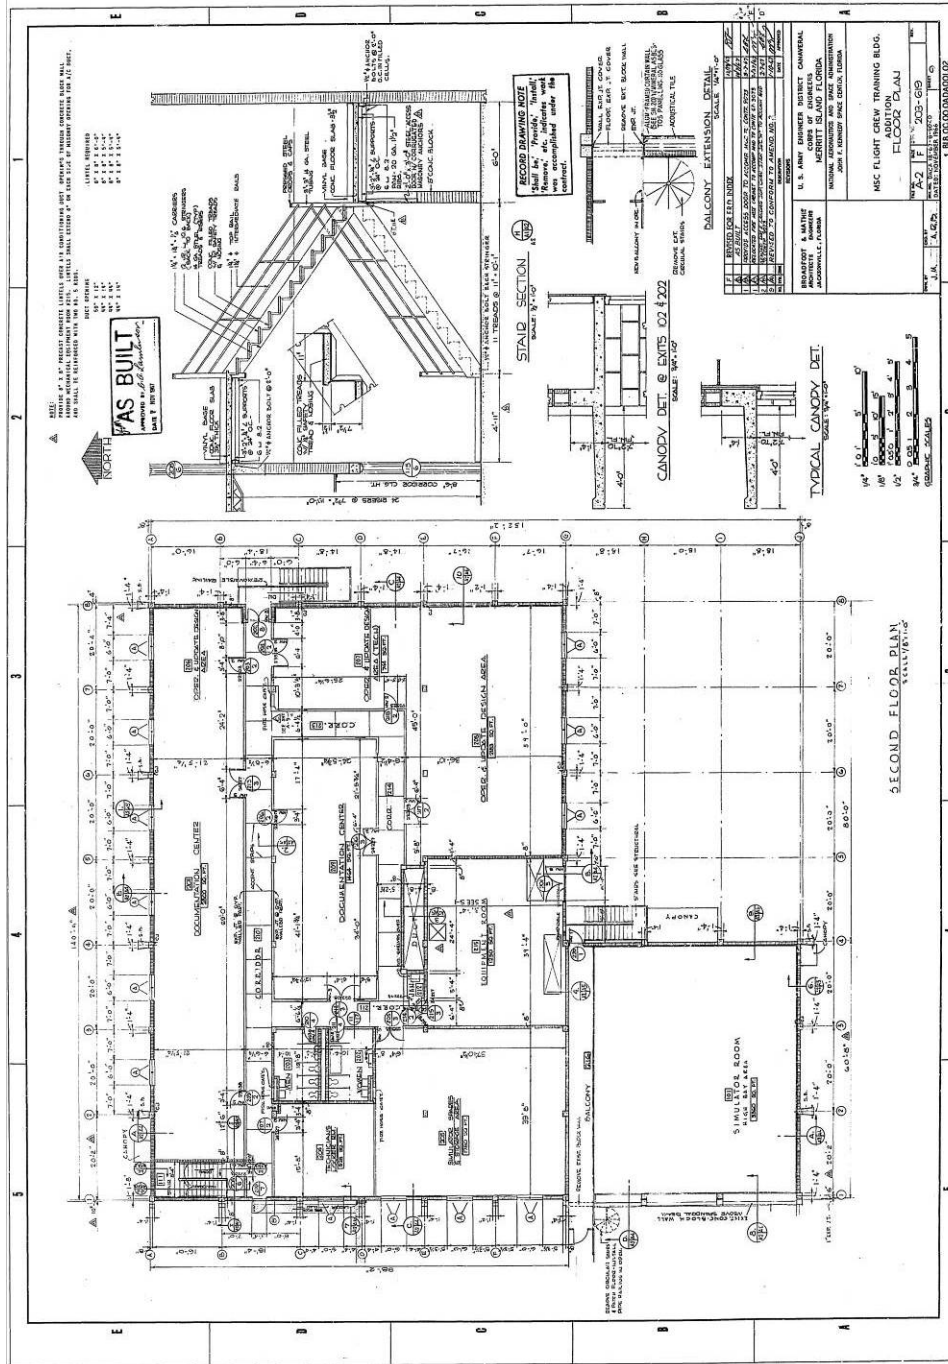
Broadfoot & Mathis, Flight Crew Training Building Addition, Second Floor Plan, November 1966, Sheet 9.
